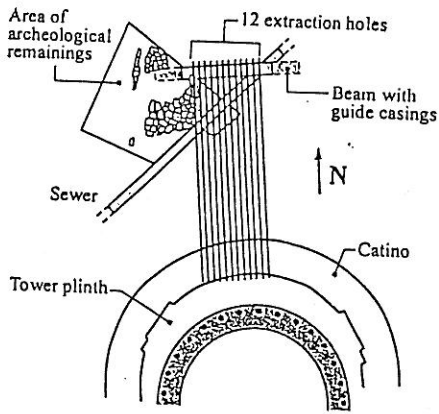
Preliminary underexcavation experiment beneath the tower: layout in plan
